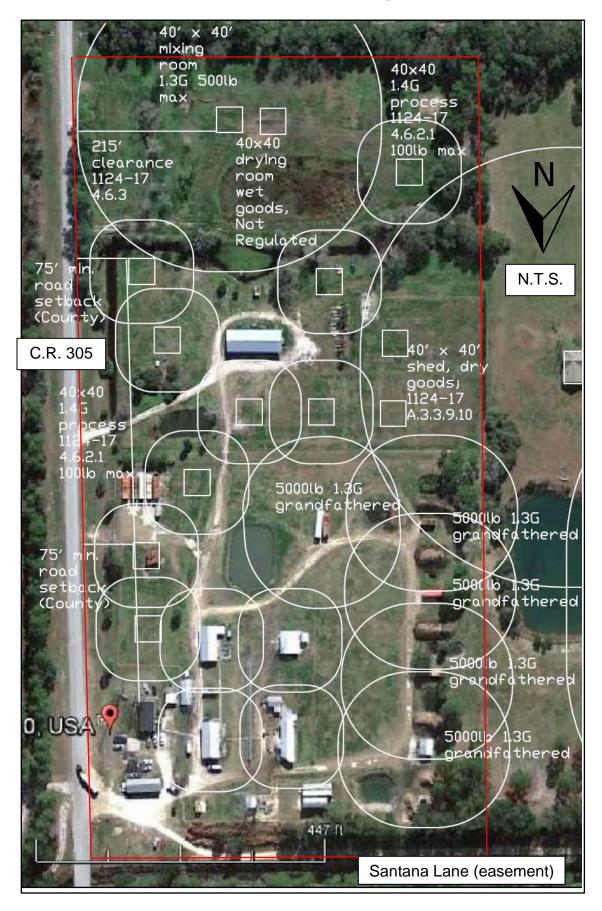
EXHIBIT "A" Santore and Sons PUD Site Development Plan
